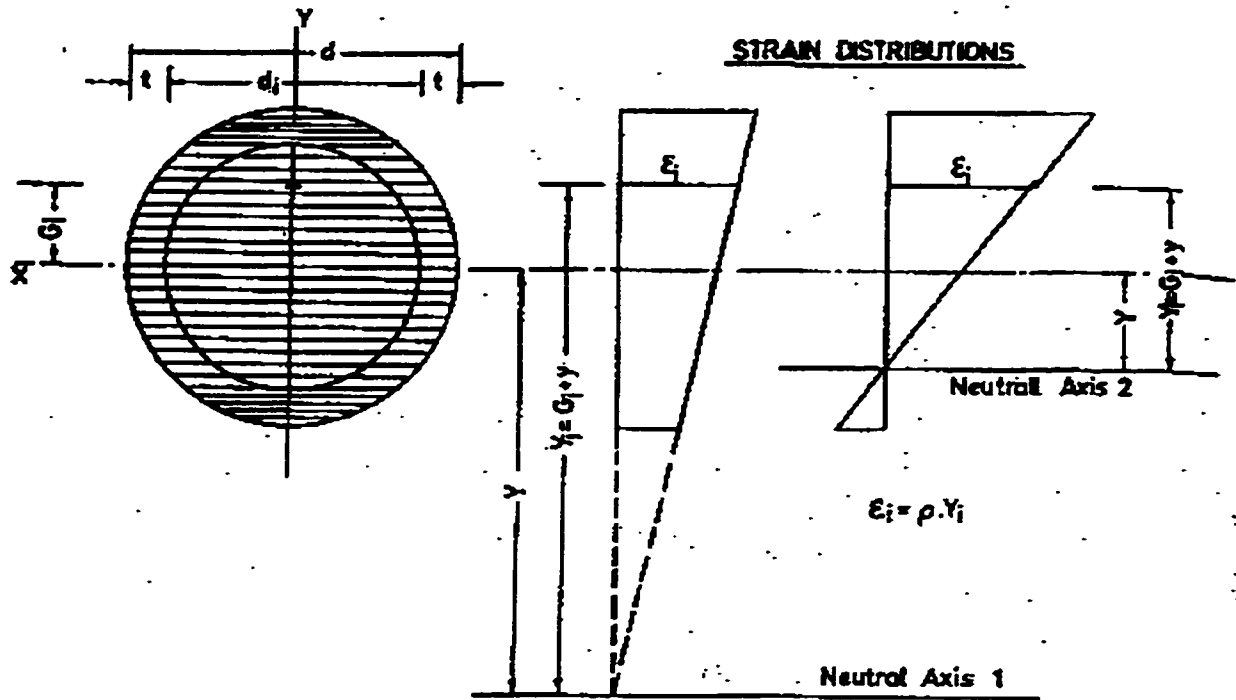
The analytical set-up of a concrete-filled steel column [Neogi et al. (1969)].
